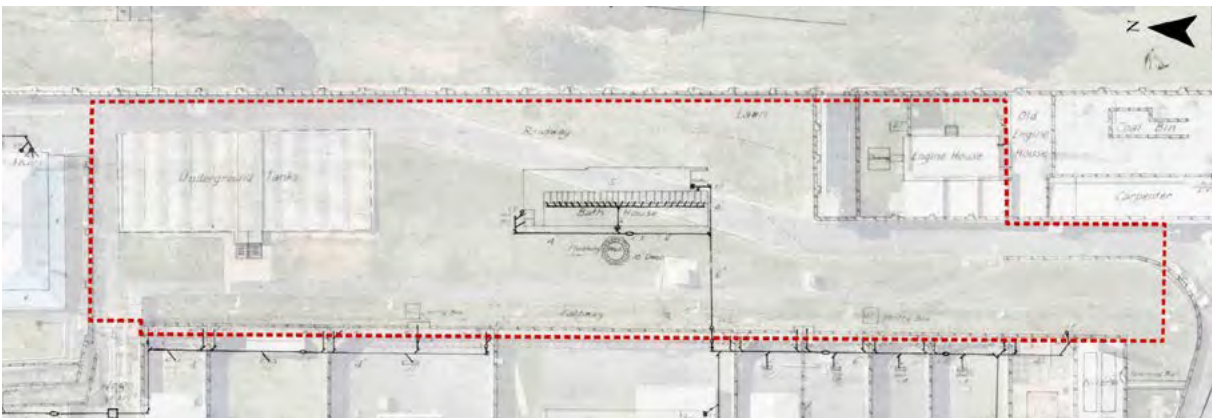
1919 electrical site plan showing the location of the 'roadway', following a similar alignment to the modern sealed surface, as well as the retaining wall in the south of the zone. It is possible that the 'roadway' follows and earlier informal path, archaeological remains of which may exist. The western side of the zone shows a 'pathway' and the previously labelled sheds are now labelled 'sentry boxes'.
